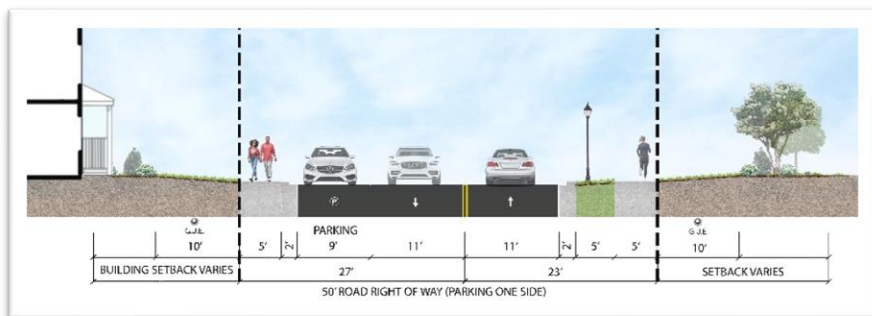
Typ. Neighborhood Road Sections (Appx. Exhibit 11.2)
